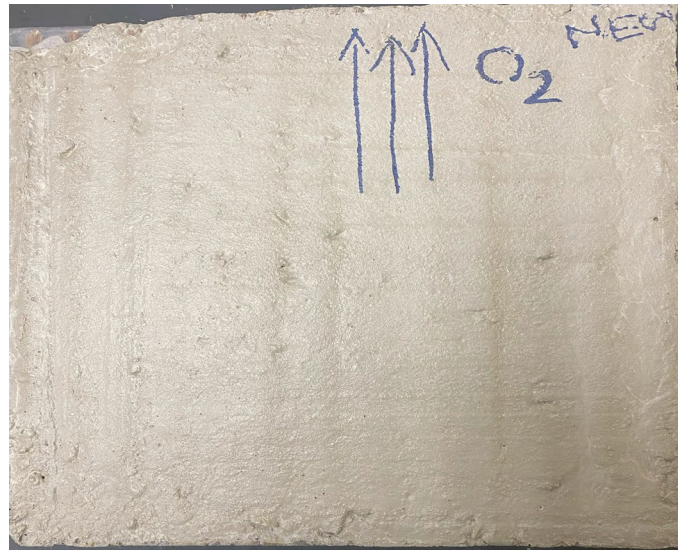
New Hemp stems reinforced concrete panel (0)_s
